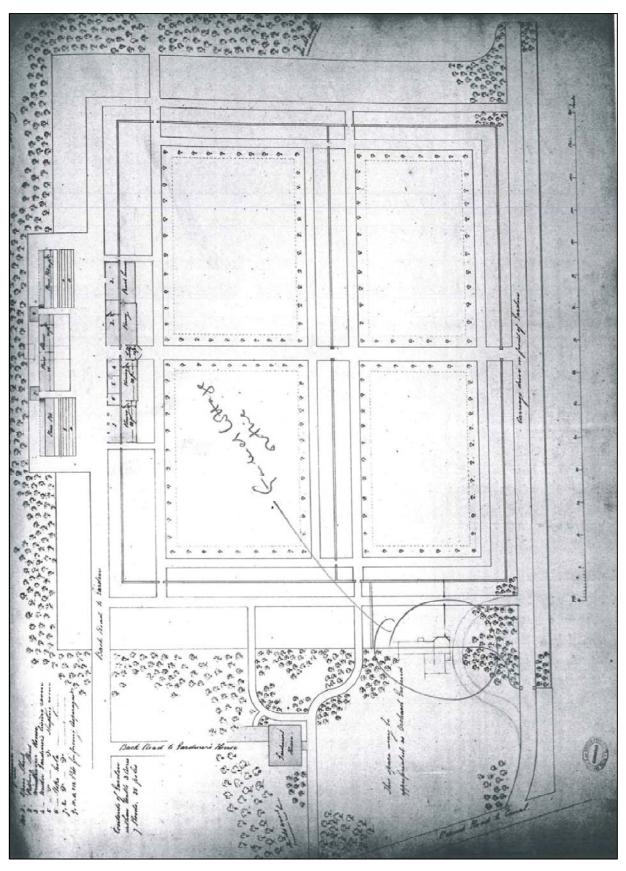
Undated plan of the kitchen gardens showing two possible locations for the Garden Cottage, c. 1840-2 (Worsley New Hall Archive, Peel Group).
